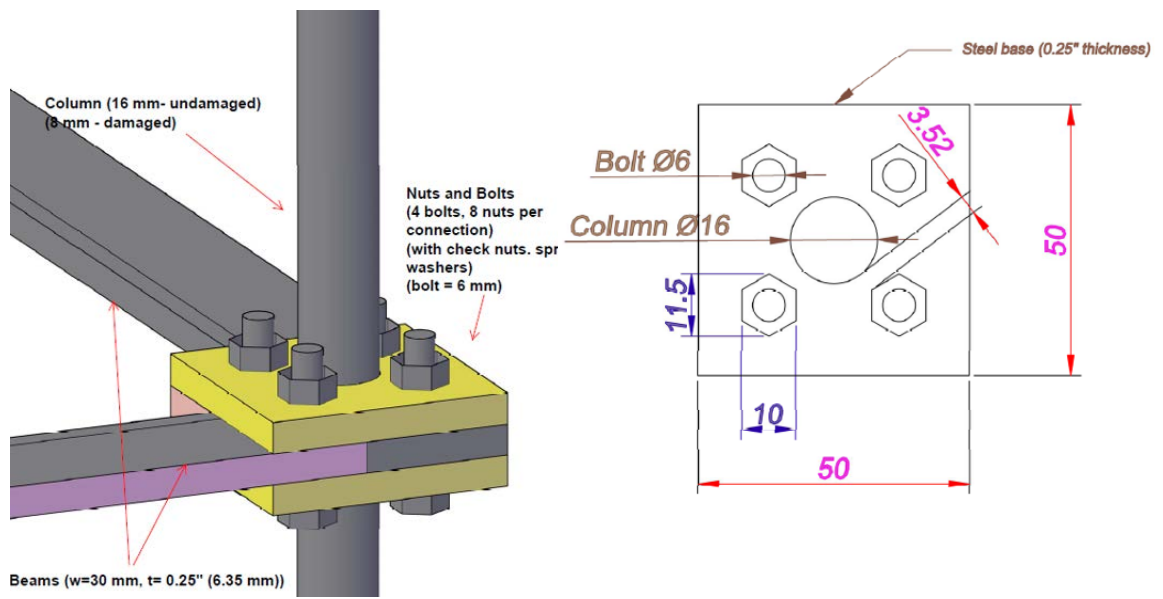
Beam-column connection detail (3-D view) Figure 4-5- Column connection detail (plan view)
